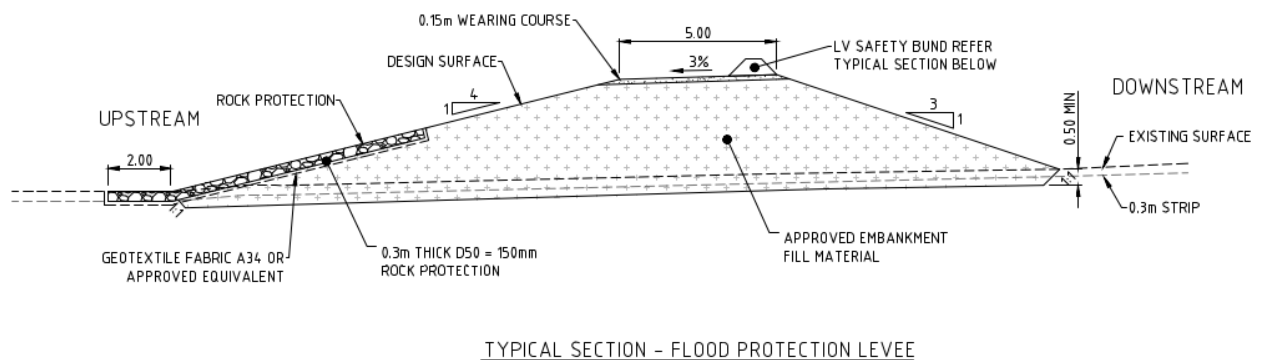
Typical section of Isaac River Levee with rock protection
